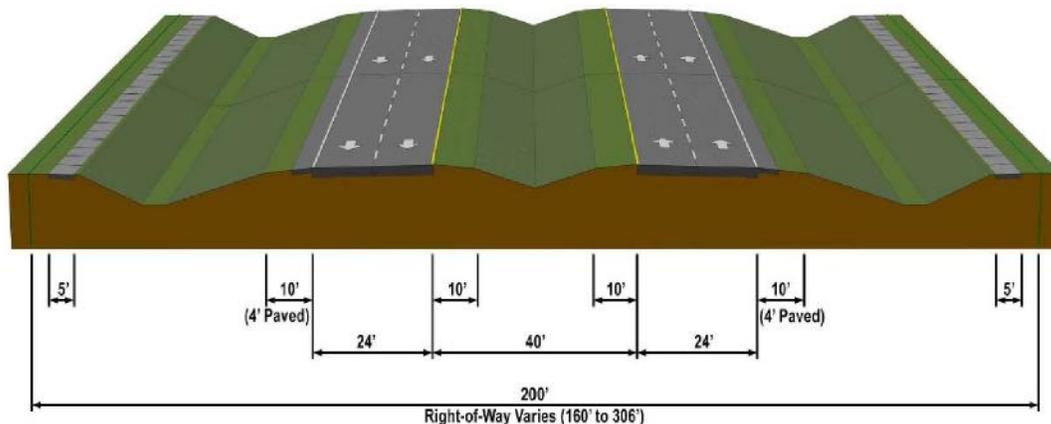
Suburban Typical Section – Alternatives 1 & 2
